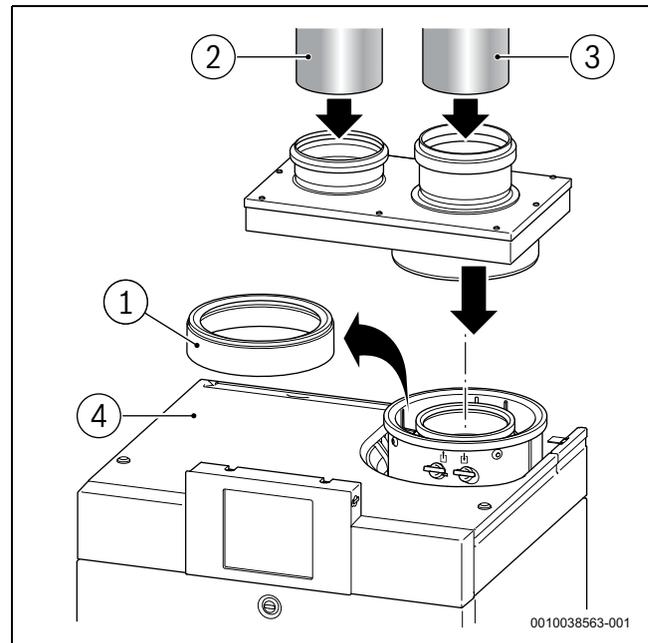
Mount the flue gas discharge adapter Ø 110-110
